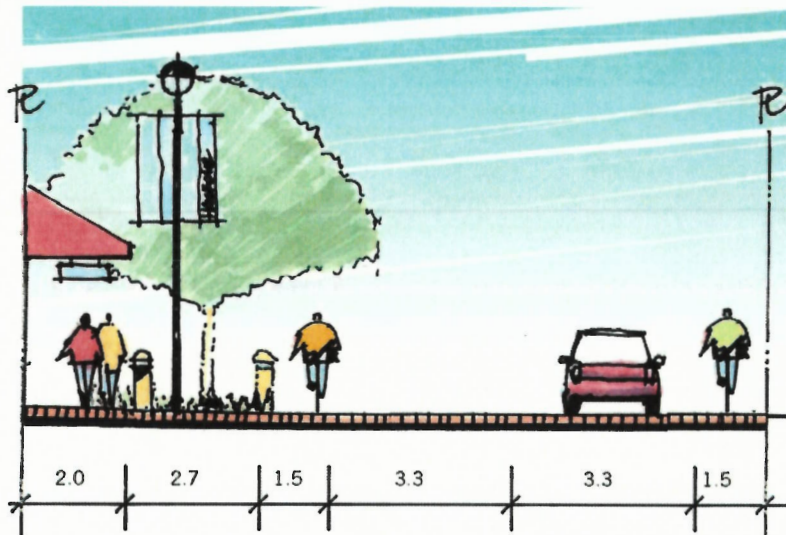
Illustrative Section across Harbour Road (Illustrating minimum streetscape widths)
